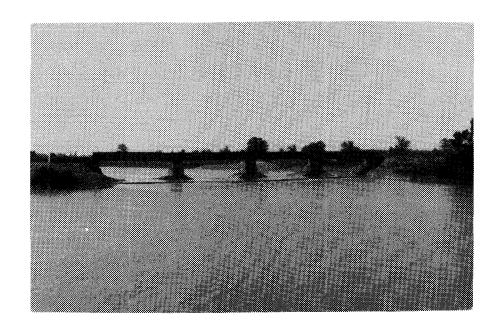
PLANTAGENET PROJECT COMPLETED IN 1981
